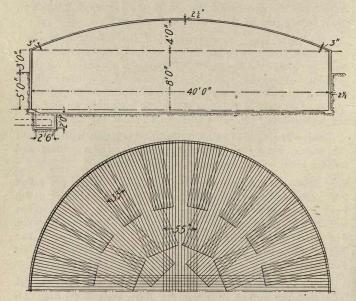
Roof Plan and Section of Tank for Montgomery Ward & Co.
